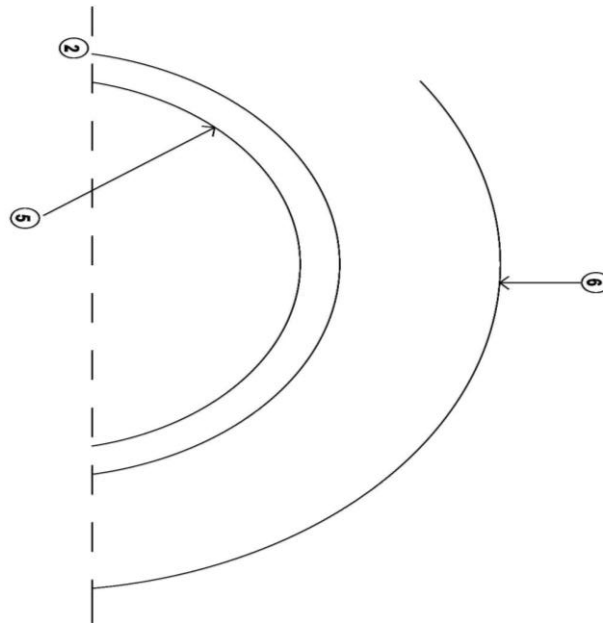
R.C Raft foundation (R.C.R.F) Plan
